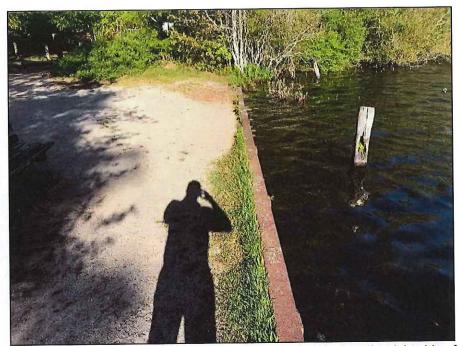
Upstream steel sheet pile wall looking right from the right side of the concrete headwall.
